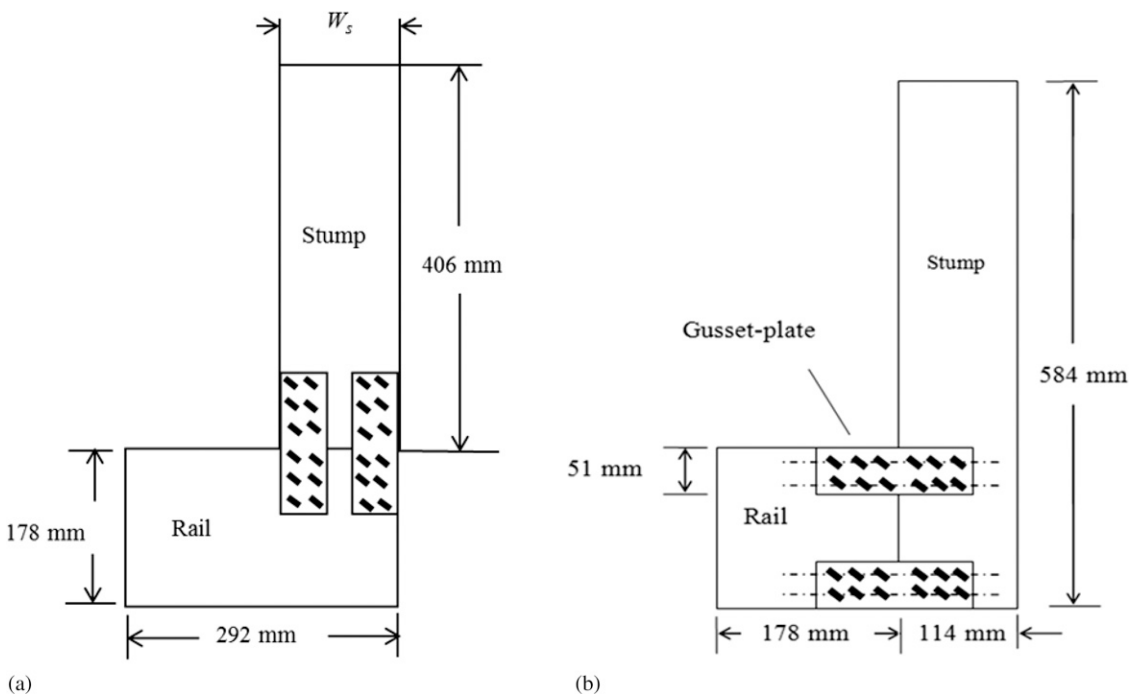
Configurations of (a) T-shaped and (b) L-shaped, one-sided, two-gusset-plate joints.
